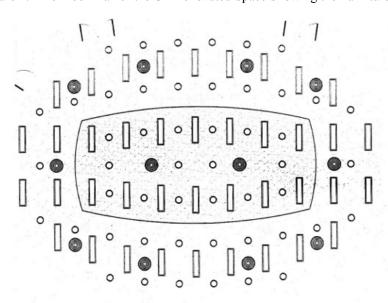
The Reflected Ceiling Plan of the Un-Renovated Space Showing the Furniture Plan
